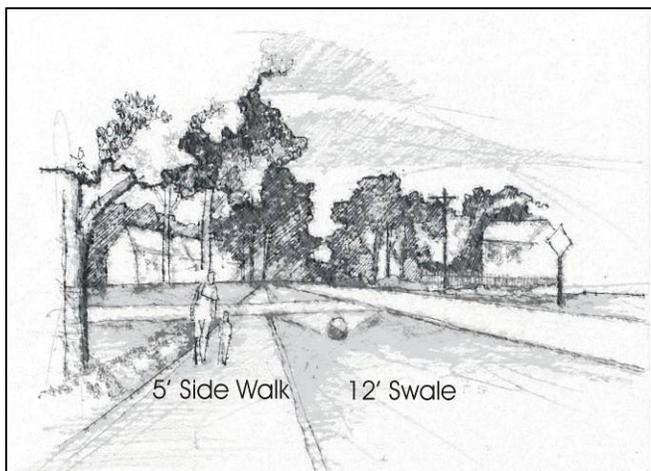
Hand-drawn sketch of proposed future sidewalk facility for Meadowlark Road or other roadways with similar cross-section. This type of sidewalk installation fills the pedestrian needs of the area, while respecting the rural character of the roadway and preserving the existing drainage infrastructure. Though right-of-way costs may be high, depending on the location, this design would eliminate the need to install expensive curb and gutter treatments and related drainage systems.
